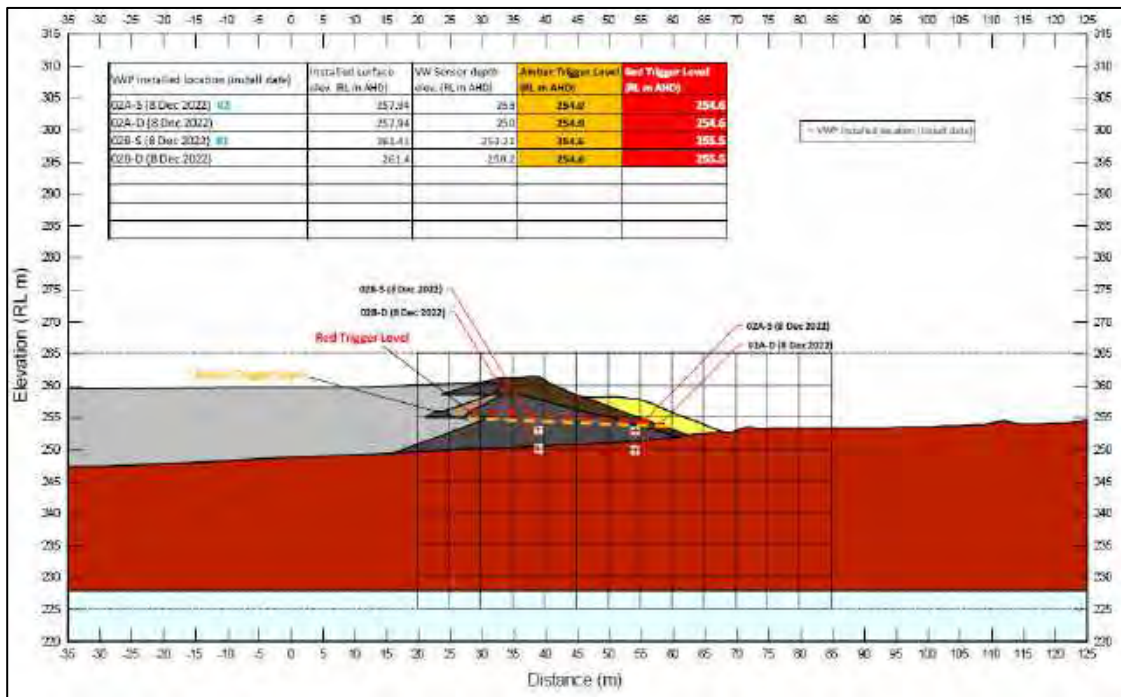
As-built FAD Cell 1 west wall embankment cross-section G - VWP trigger level profile
